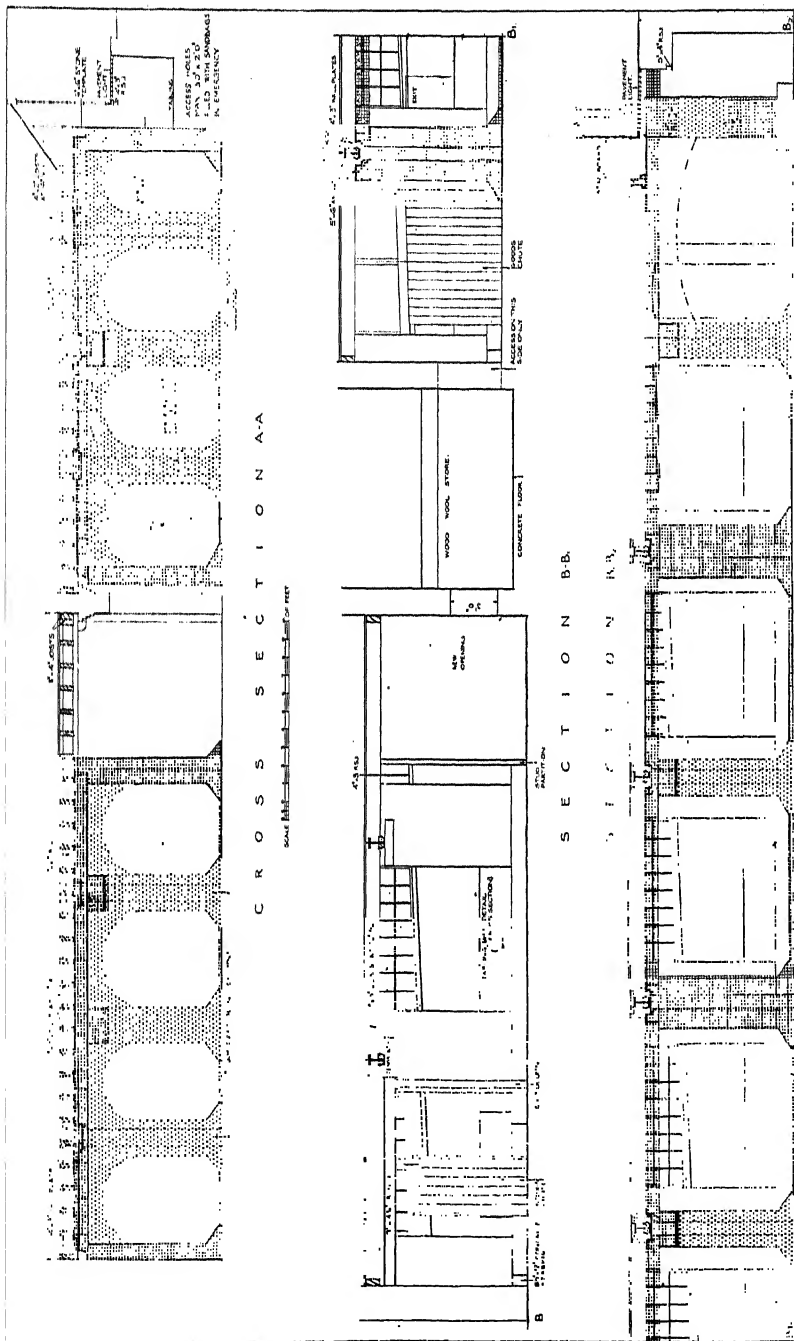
Section of basement shown in Fig. 112 and indicating vulnerable nature of pavement lights.
